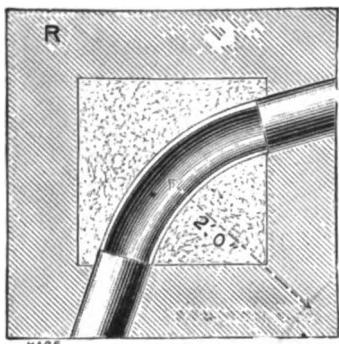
Manhole chamber; short obtuse-angle bend, 24-inch radius on centre line.
